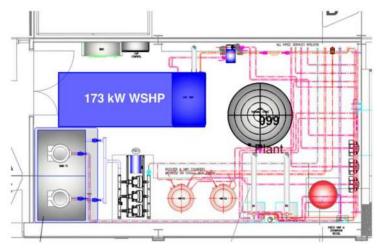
Proposed UoP Marine Station WSHP (blue) installation in main plant room
